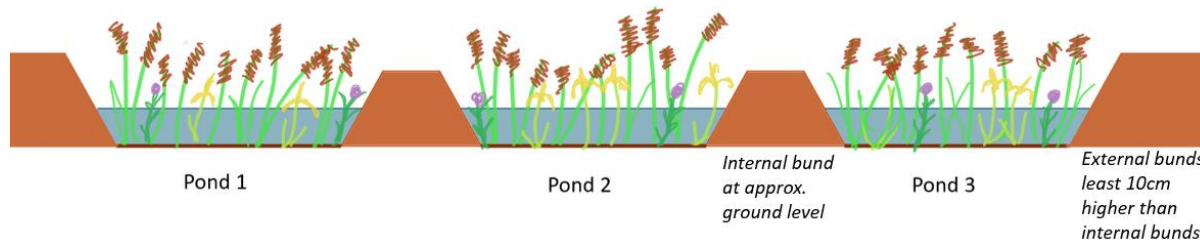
Cross section of treatment train style pond system, with internal and external bunds, and planting throughout the basins
